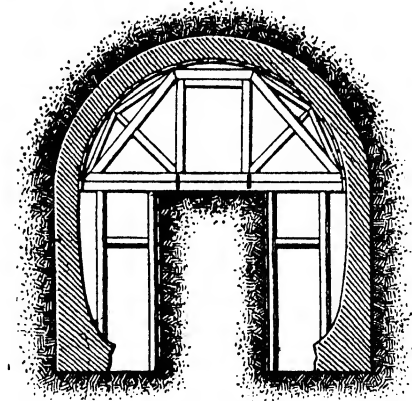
TYPICAL MASONRY LINING FOR TUNNELS.
